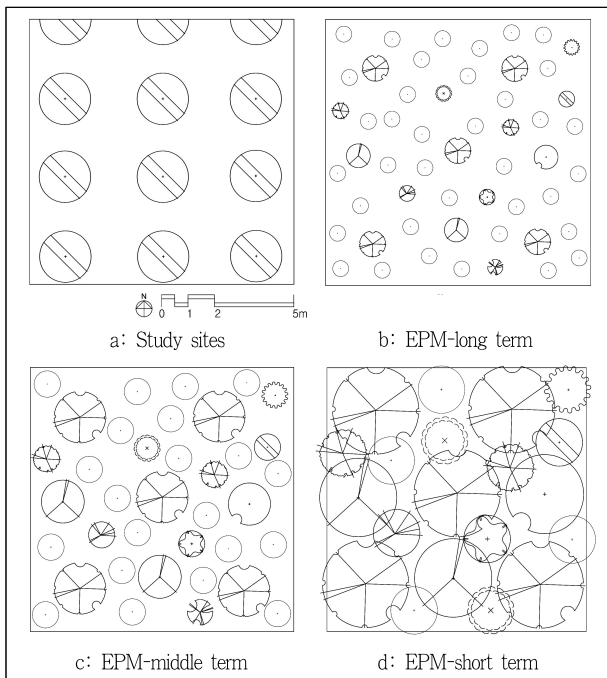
Typical plan view examples of tree plantings for study sites and EPM
